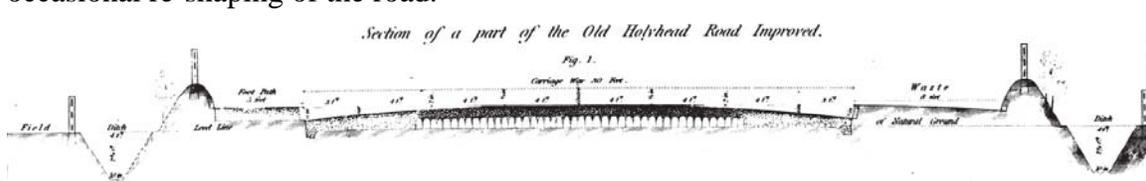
Section of a part of the Old Holyhead Road Improved, showing a Telford road profile. Thomas Telford, 1833.
